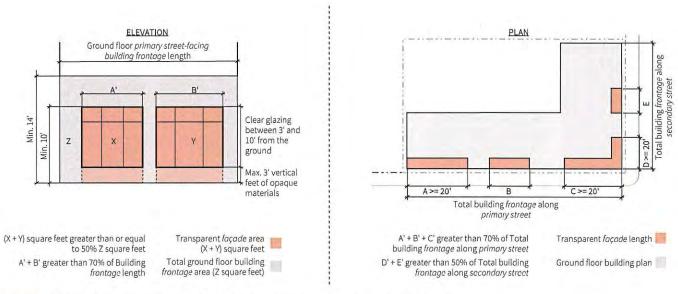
Requirements of transparent frontages for building corners at intersections, and along primary and secondary streets.
